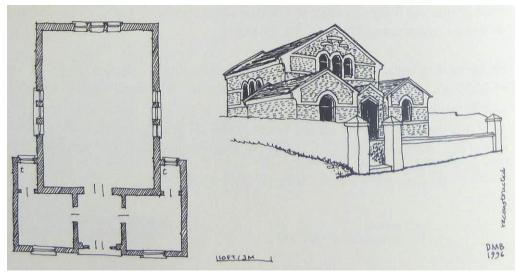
Plan and perspective of the meeting house of 1872 (Butler, vol. 1, p. 230)
